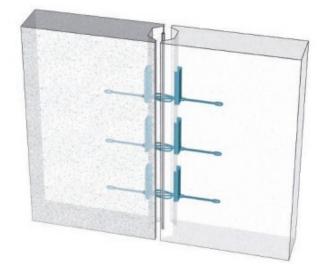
PVL Connecting Loops in the joints of wall panels (Peikko, 2020)
